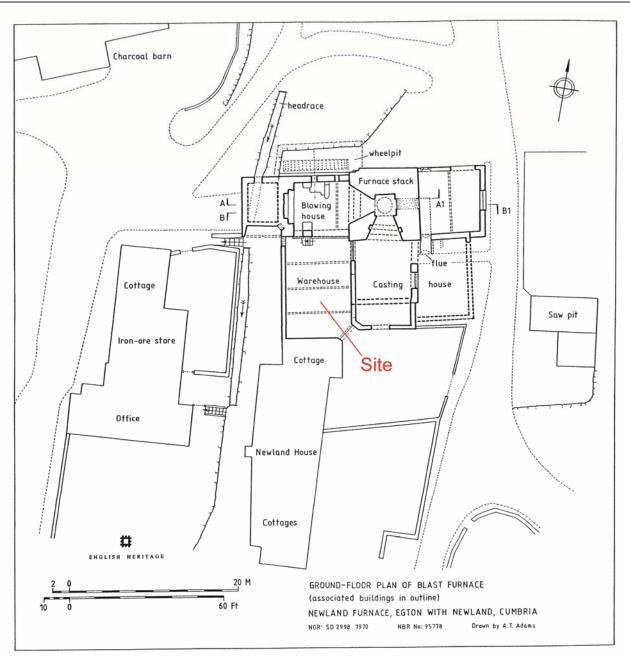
Ground floor plan of the blast furnace (Goodall 2001, figure 4), showing the location of the barn (labelled 'warehouse')
